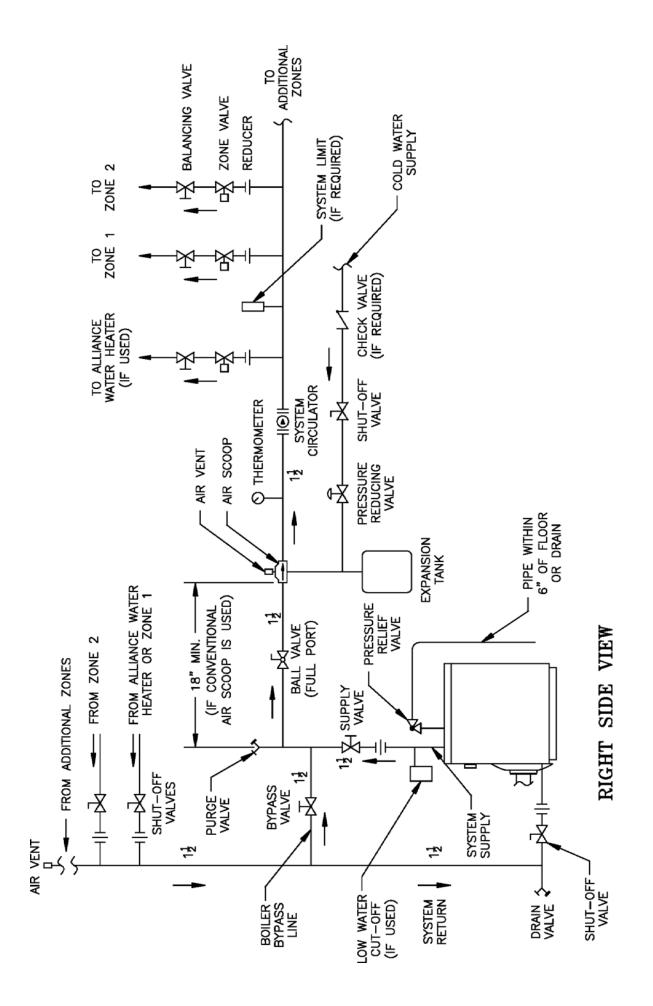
B: Preferred Water Boiler Piping for Zone Valve Zoned Heating System - Supply Side Circulator
